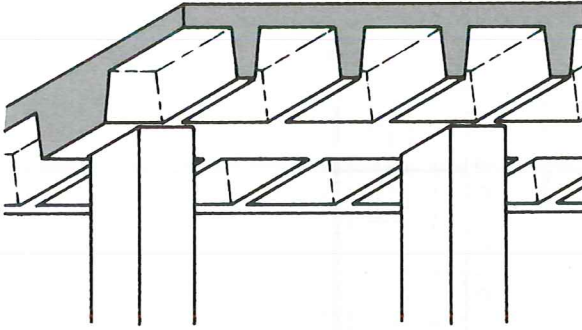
Pan joist roof construction is a one-way structural system using a ribbed slab formed with pans. Spans of up to 50' are common.
